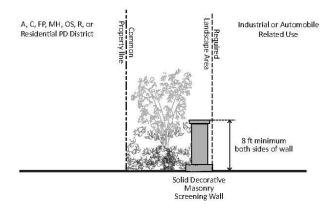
H: WALLS BETWEEN INDUSTRIAL AND OTHER DISTRICTS
